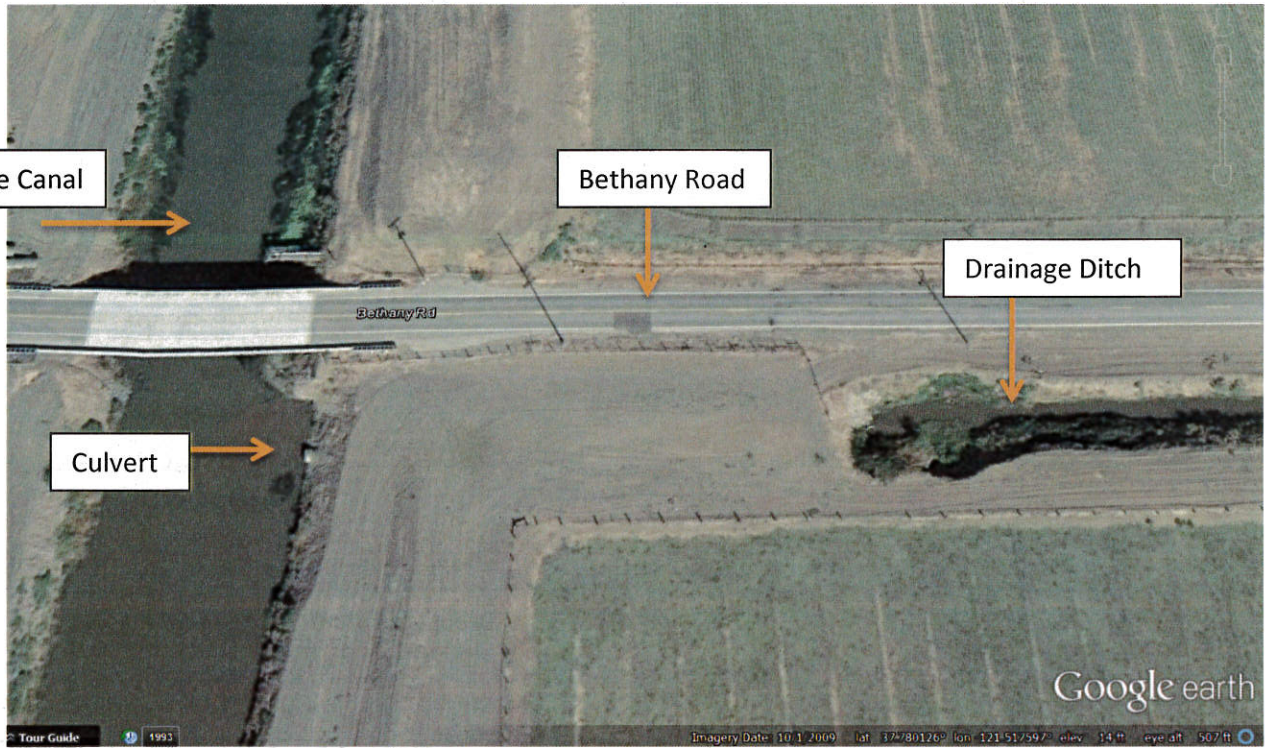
Intake Channel – Drainage Drain – Culvert (Photo Date 10/1/2009)
